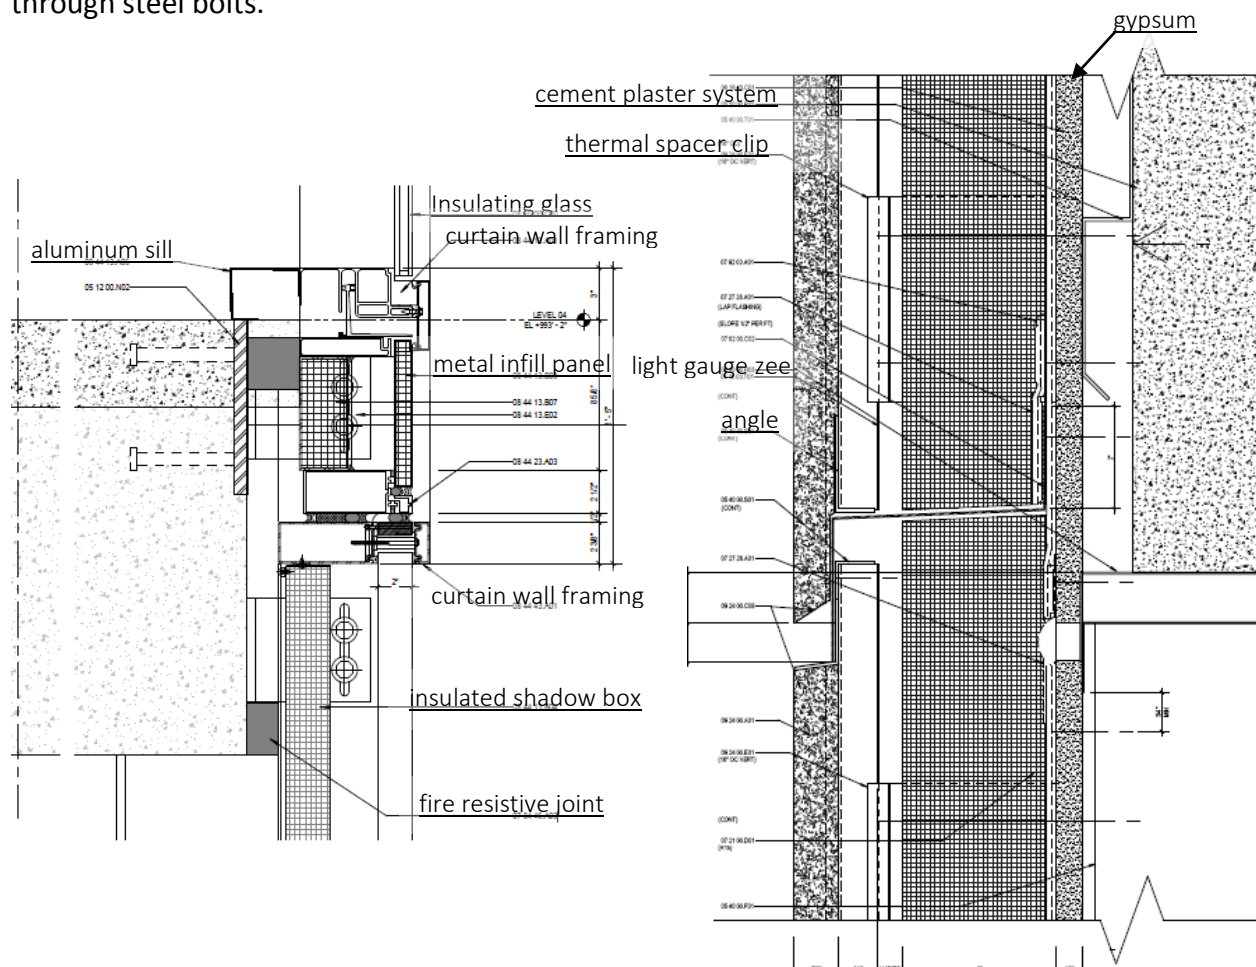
| Curtain Wall Connection Detail (left) and Stucco Panel Wall Envelope (right) from SmithGroupJJR
